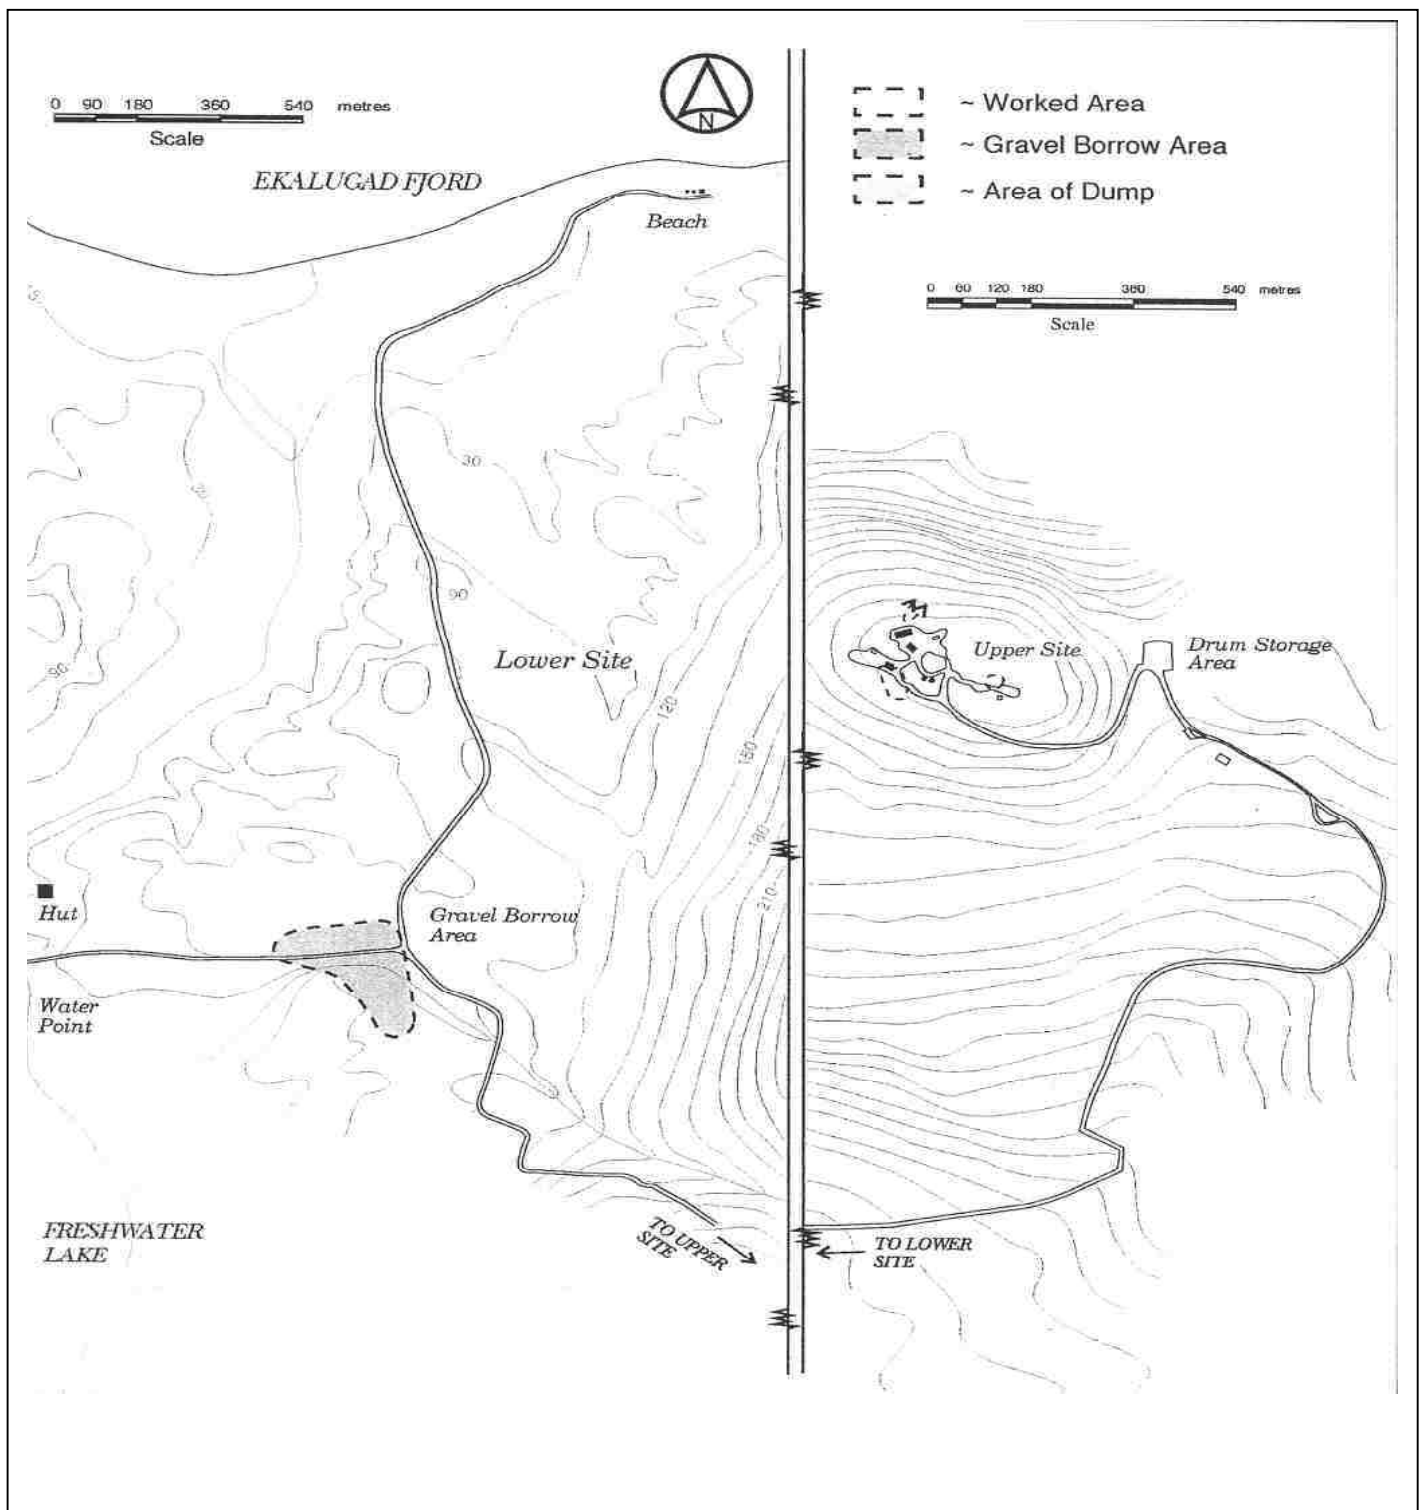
General Site Layout – FOX-C DEW Line Site
